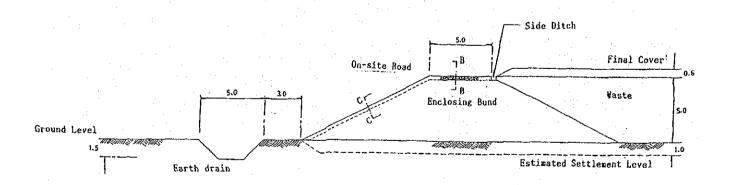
Typical Cross Section of Surrounding Drain
